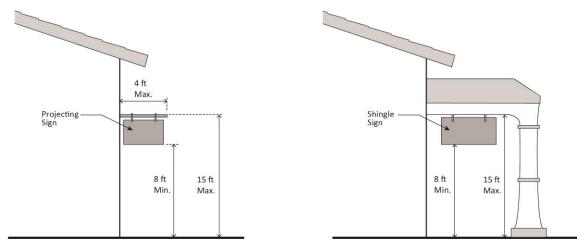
C: PROJECTING AND SHINGLE SIGNS
